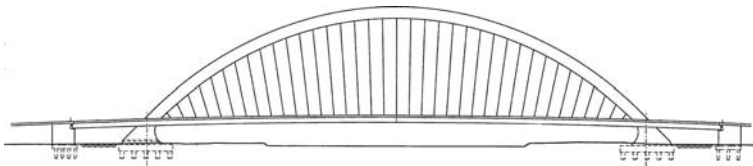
Indian River Inlet Bridge elevation (Modified IRIB Specification and Construction Plans).
